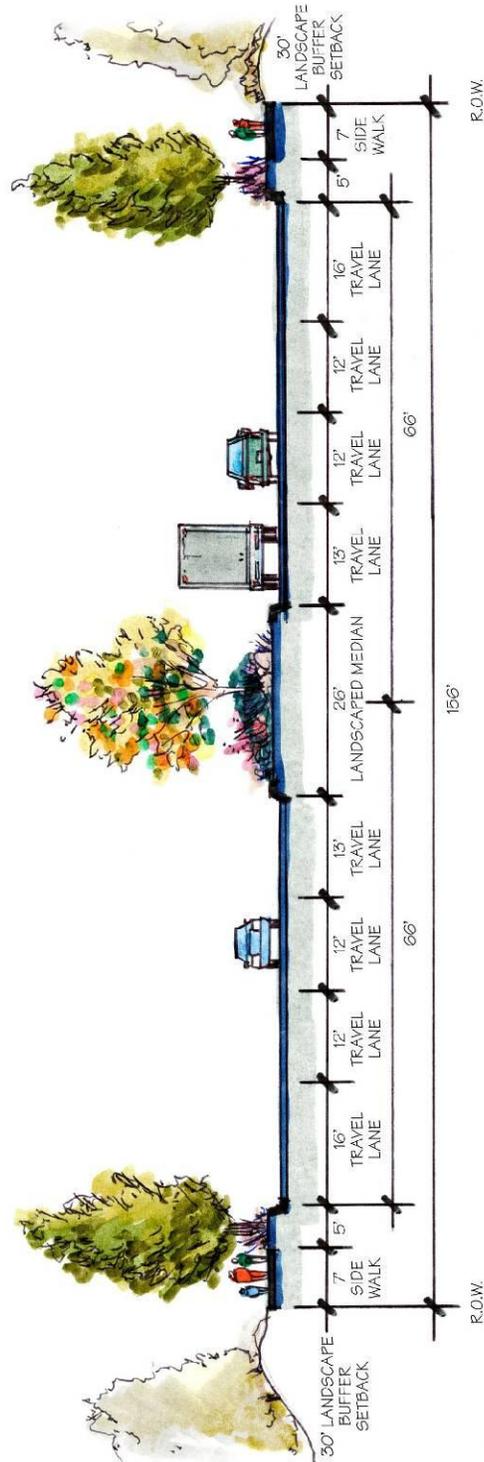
Modified Major Highway – 6 Lanes – Cross Section A-A (Valley Boulevard)
